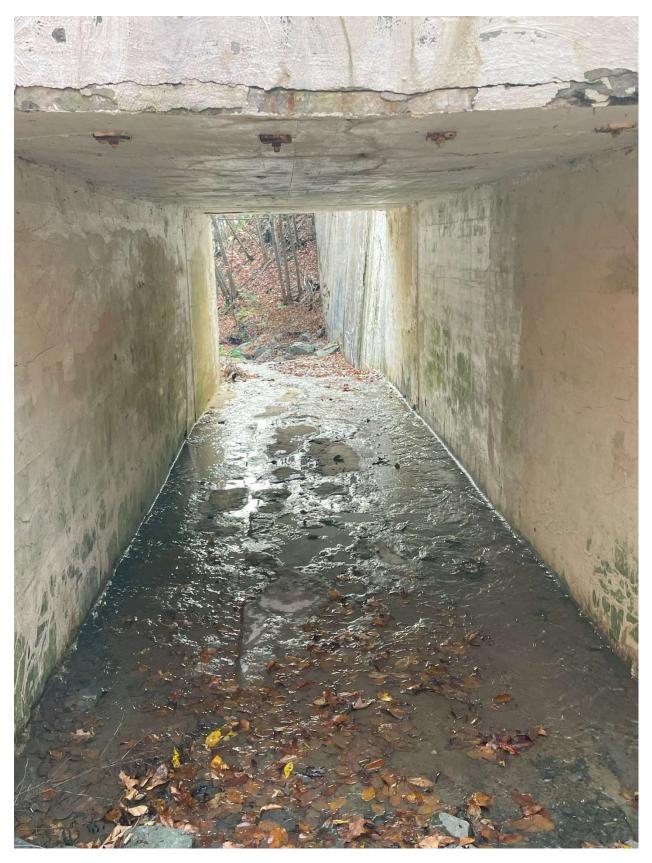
Maplewood Road culvert looking east. No embedment throughout the culvert.
